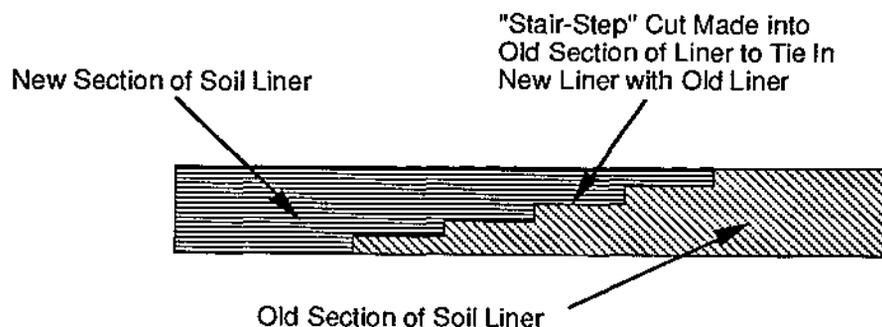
Tie-In of New Soil Liner to Existing Soil Liner
